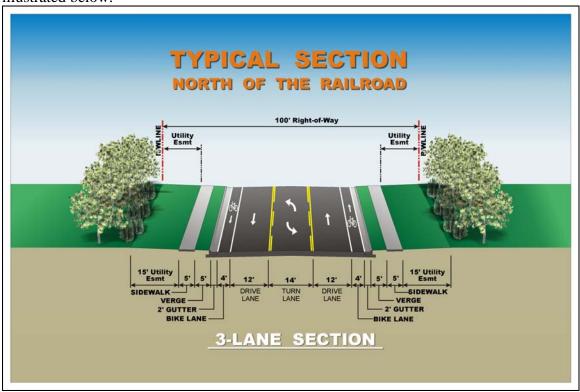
A: Urton Lane Three-Lane Typical Section.
